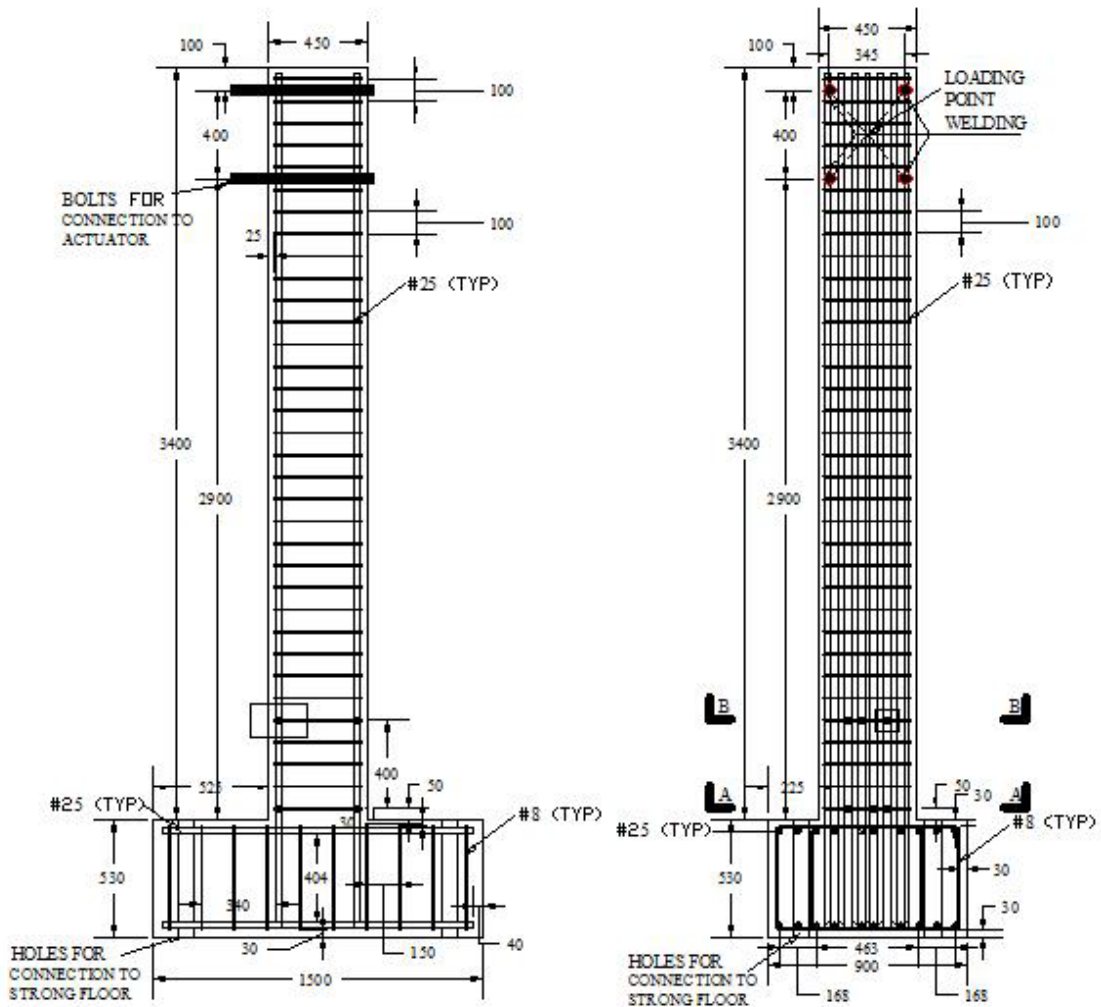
Column and Foundation Elevation Views (units in mm)
